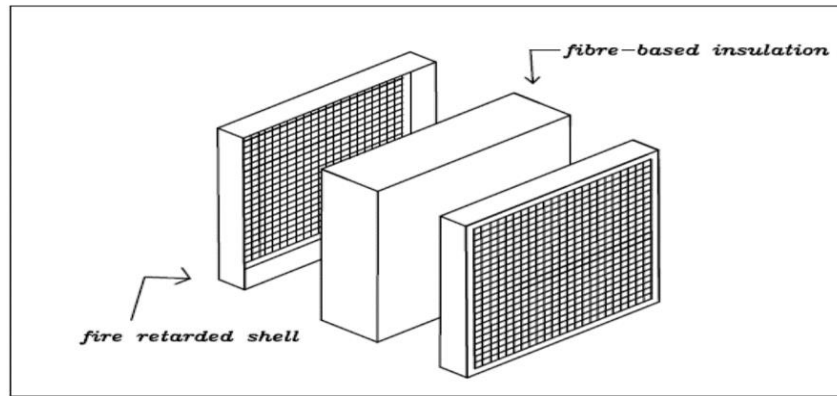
Modular breathing panels in framed construction. (Source: Imbabi, 2006)
